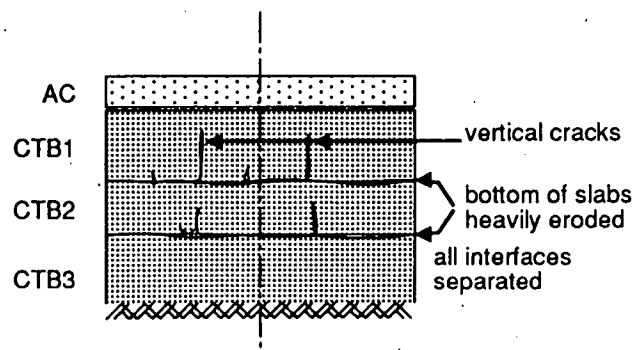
Typical failure mode of CTB pavement at Beerburum, Australia (103).
